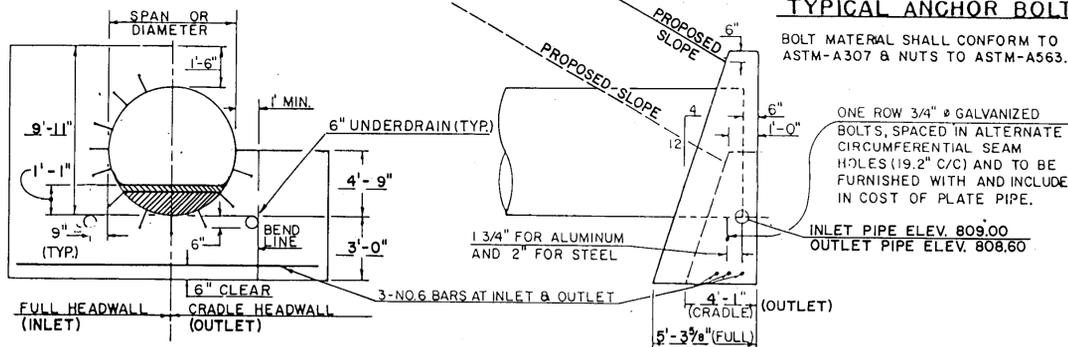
DETAILS OF STRUCTURAL PLATE PIPE CULVERTS
